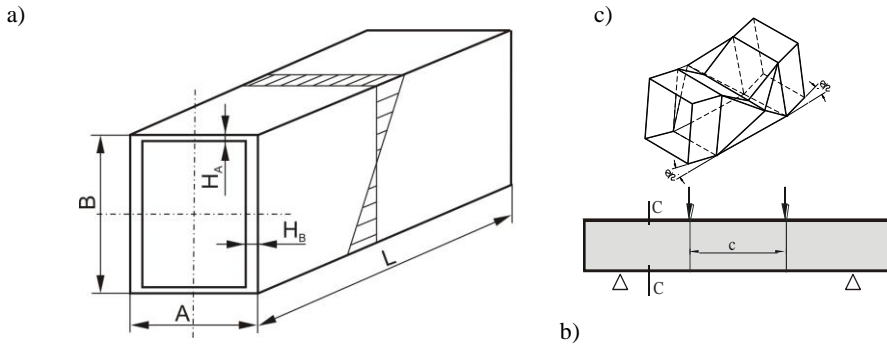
Box-section girder under pure bending: a) dimensions, b) load and support lay-out, c) theoretical model of the plastic mechanism of failure
